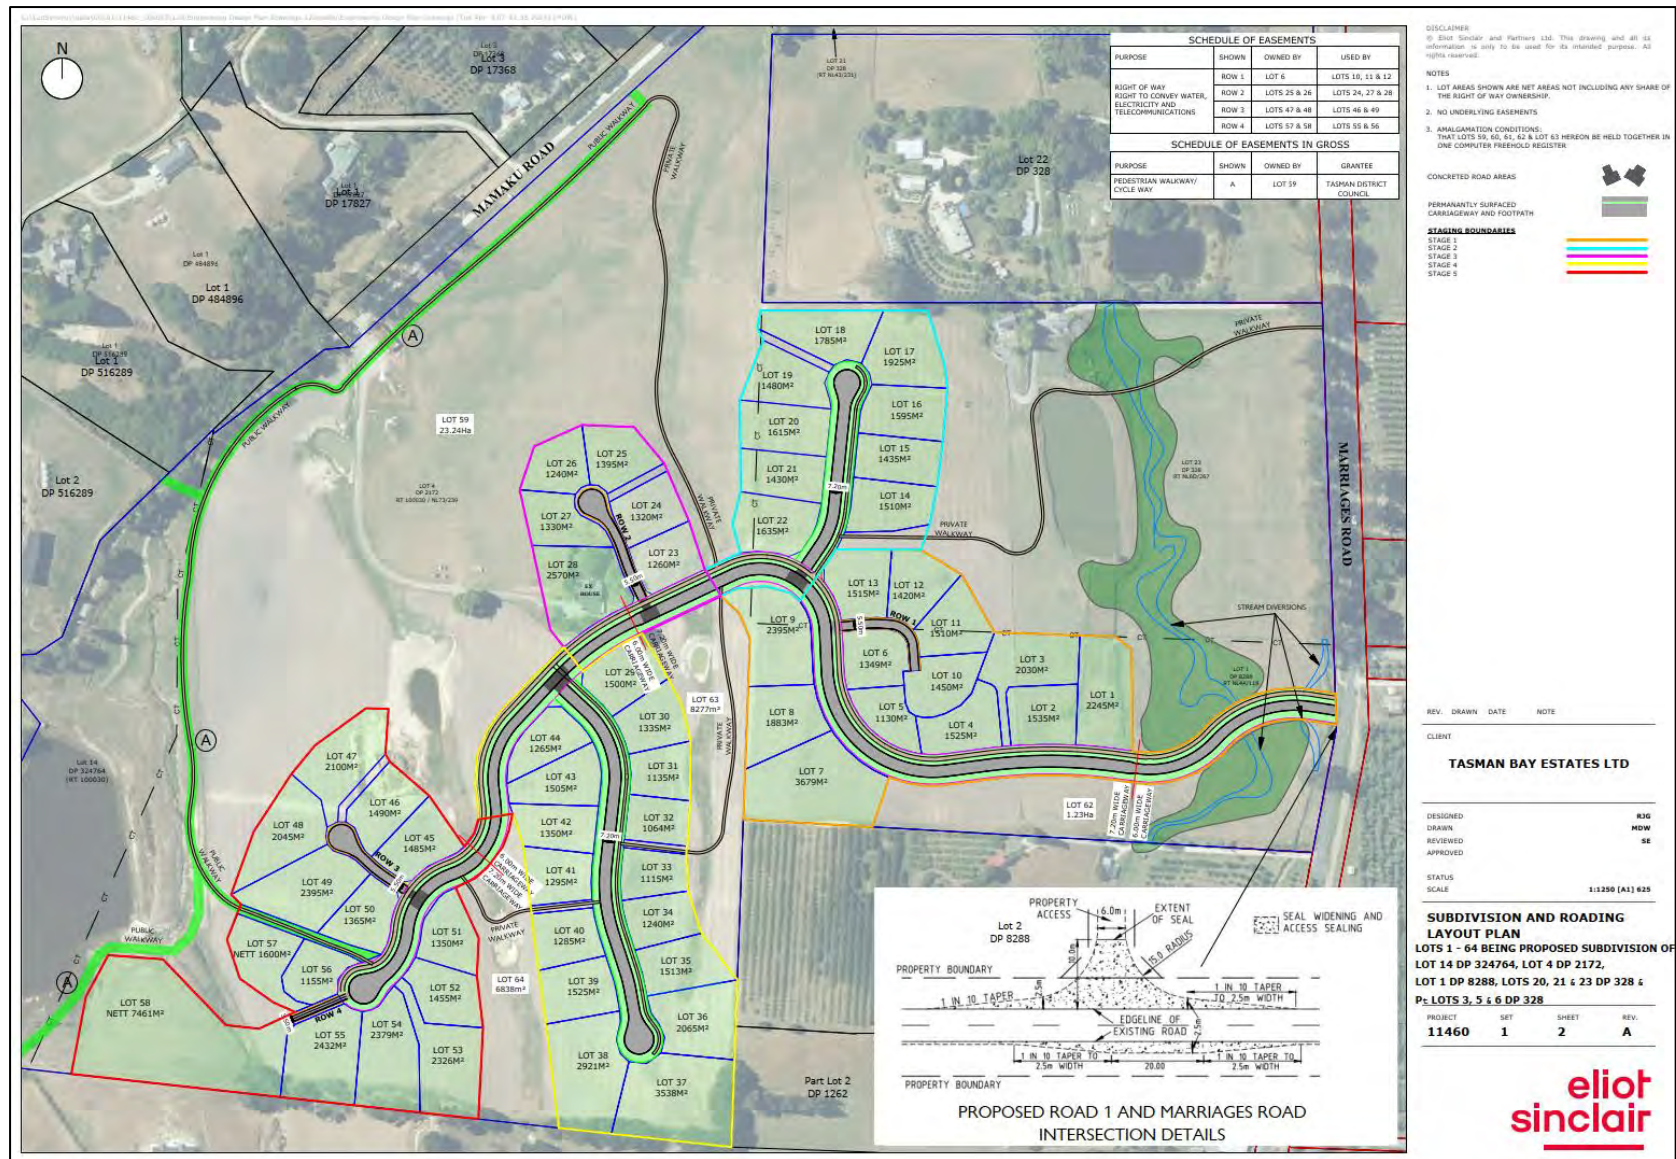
Subdivision and roading layout plan. Source: Eliot Sinclair.
